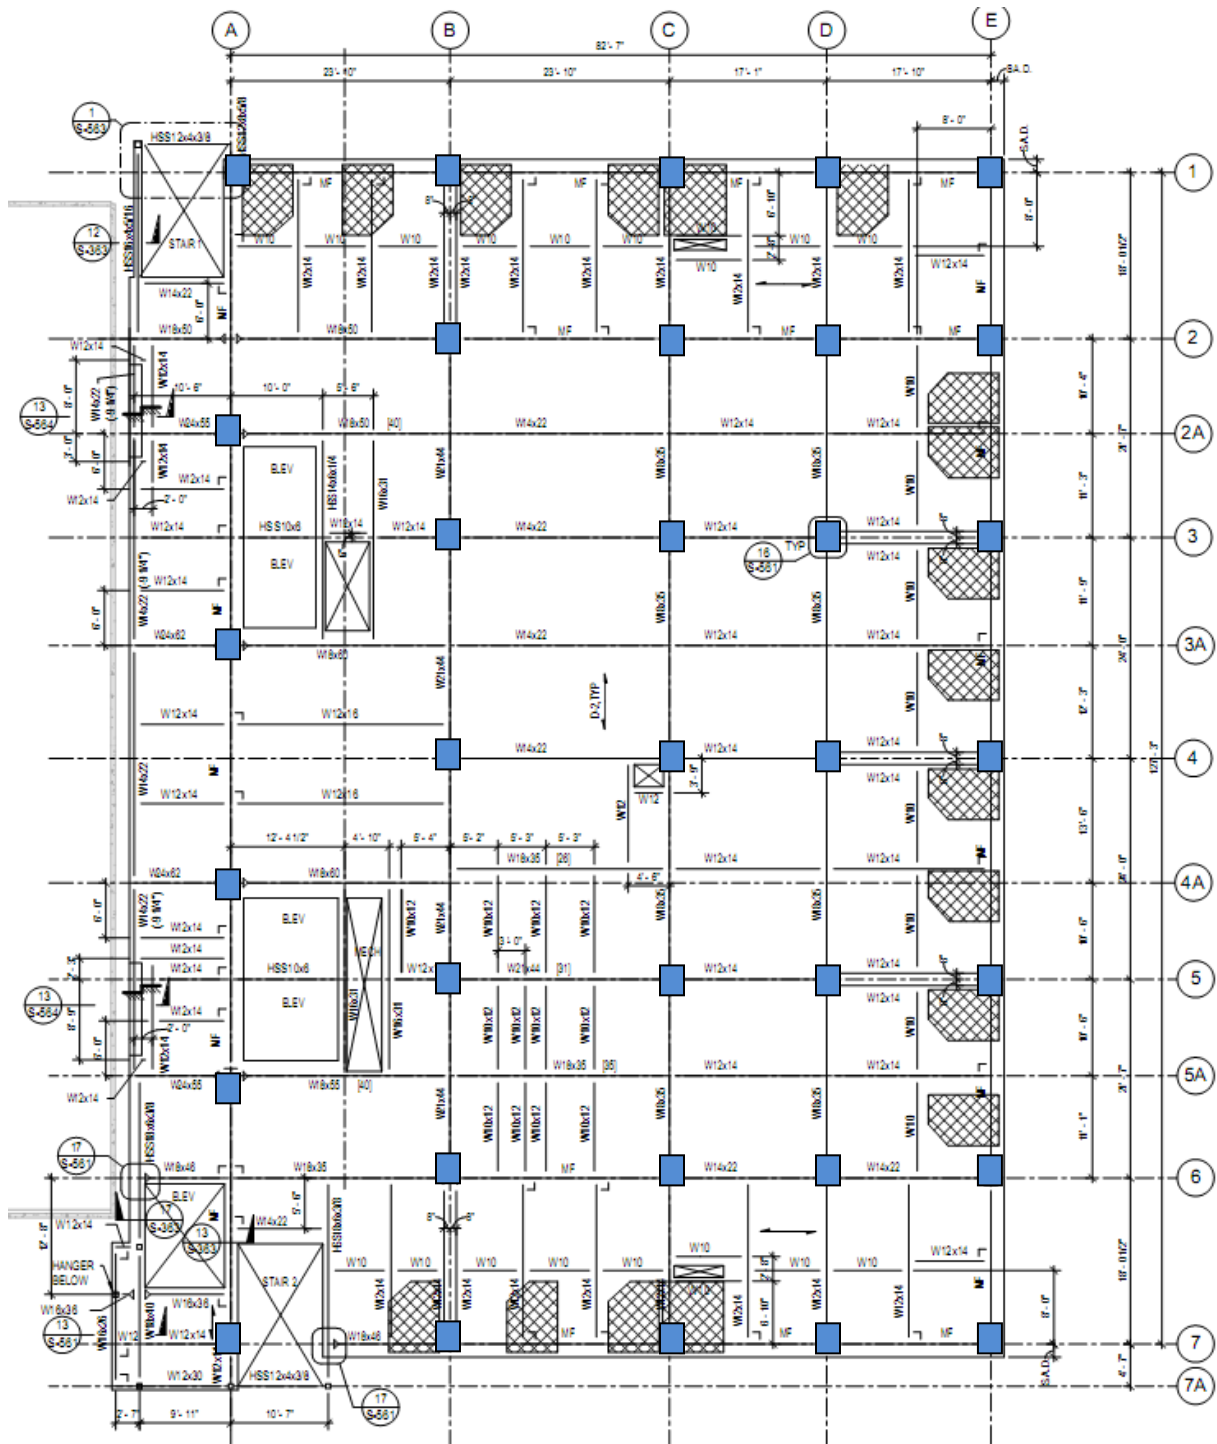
TYPICAL FRAMING PLAN WITH COLUMNS HIGHLIGHTED. DRAWINGS COURTESY OF JACOBS CARTER BURGESS.
